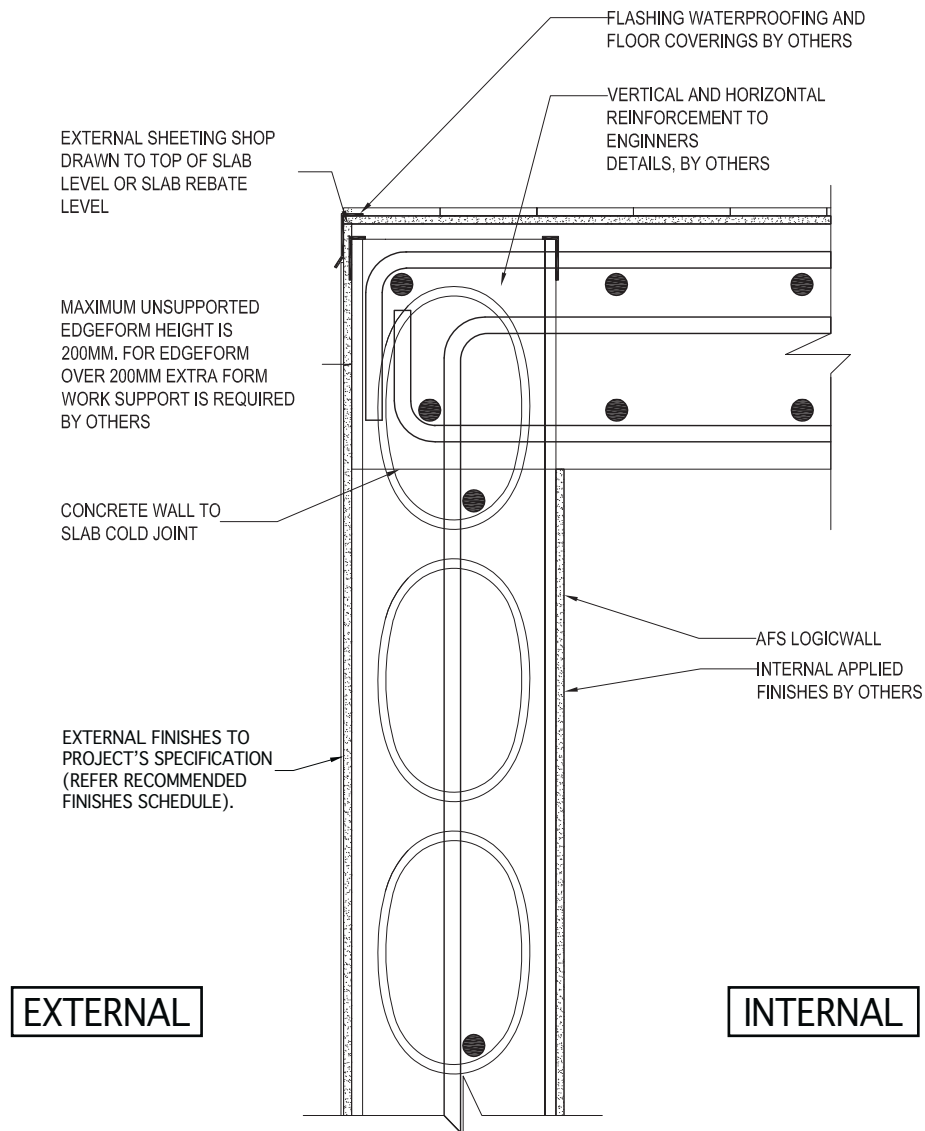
External Wall/Slab Junction For Typical Raft Slab
